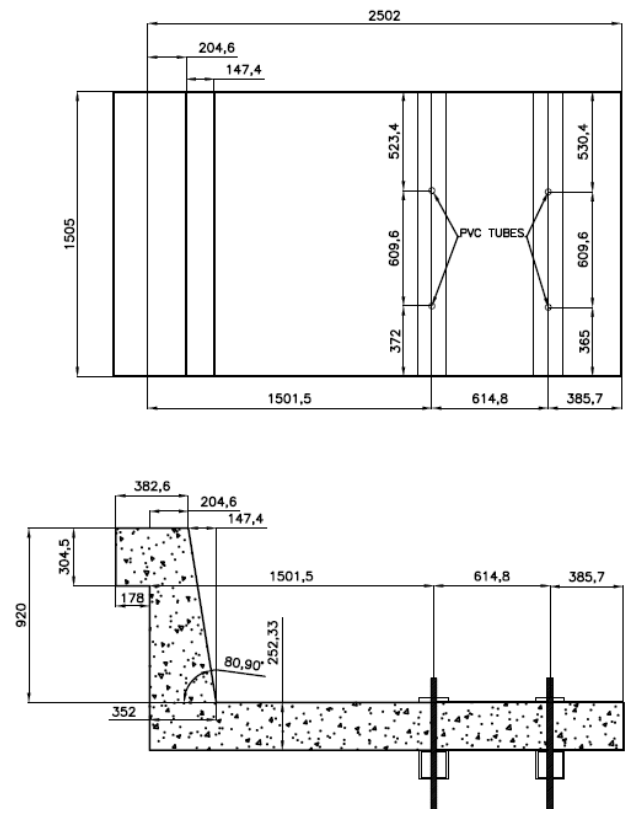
As-built dimensions for SP-02. All dimensions in mm.
